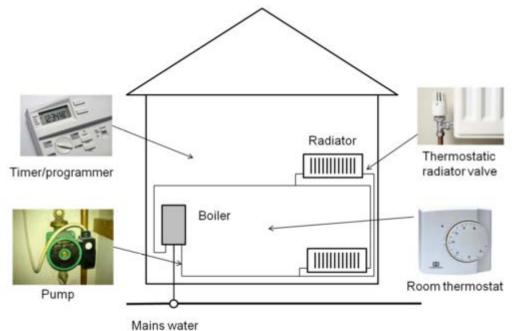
Typical components in a central heating system used in a UK dwelling (Source: Kane, 2013)
